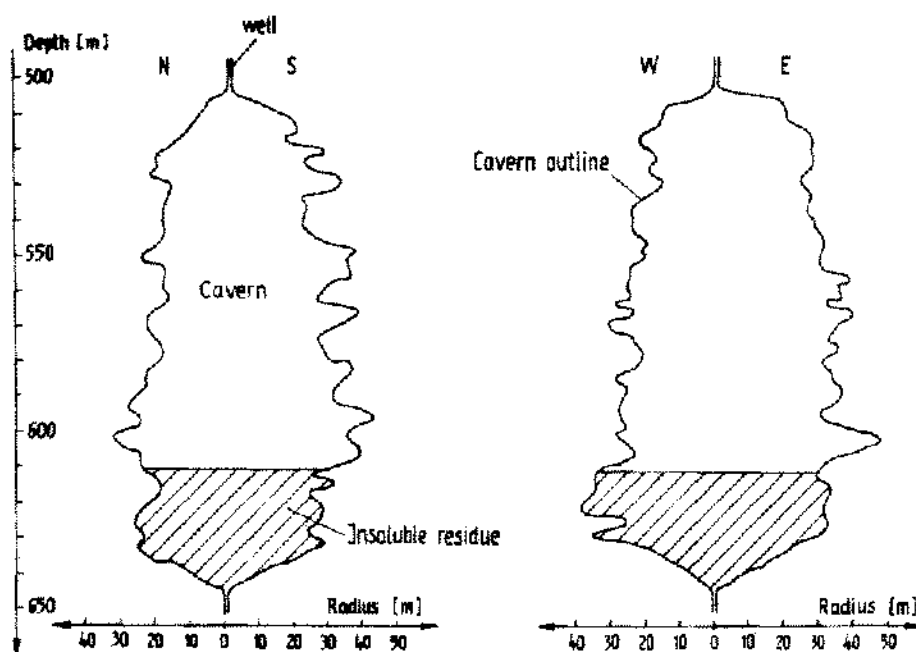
Vertical sections through a leached gas storage cavern—Underground gas storage facility at Bernburg.
